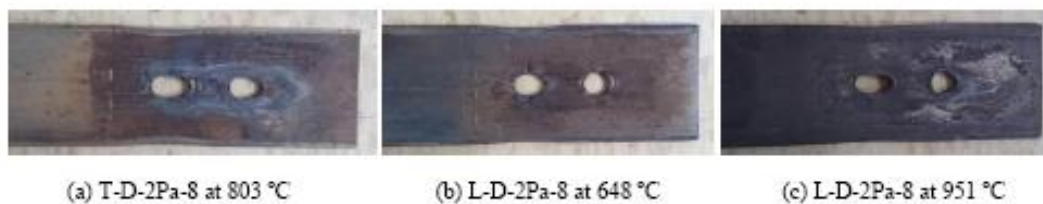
Failure mode of two-parallel bolted connection specimens at elevated temperatures
